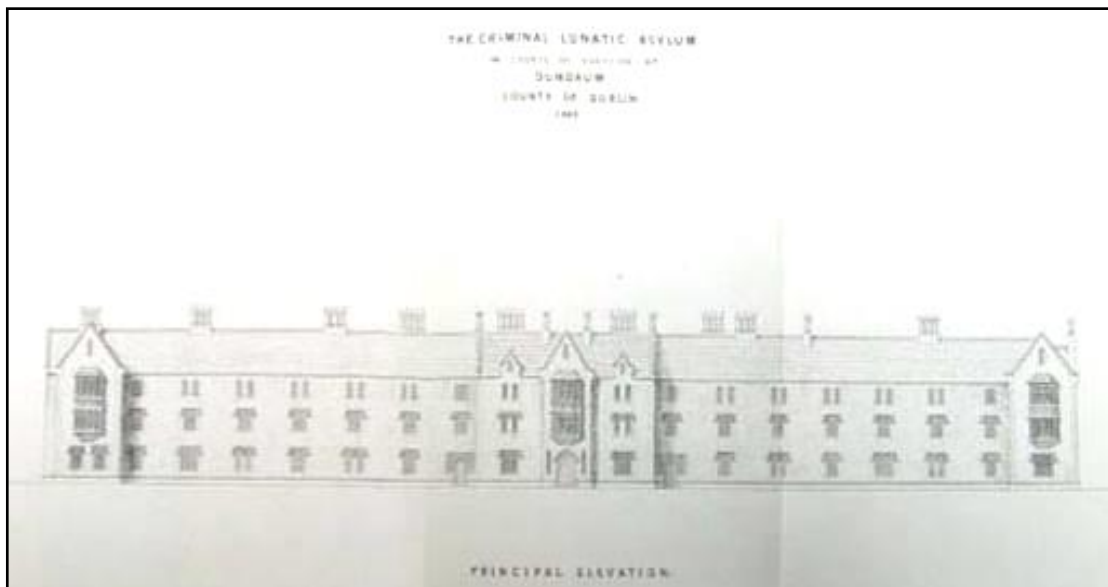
1848 Criminal Lunatic Asylum plan, proposed principal elevation
